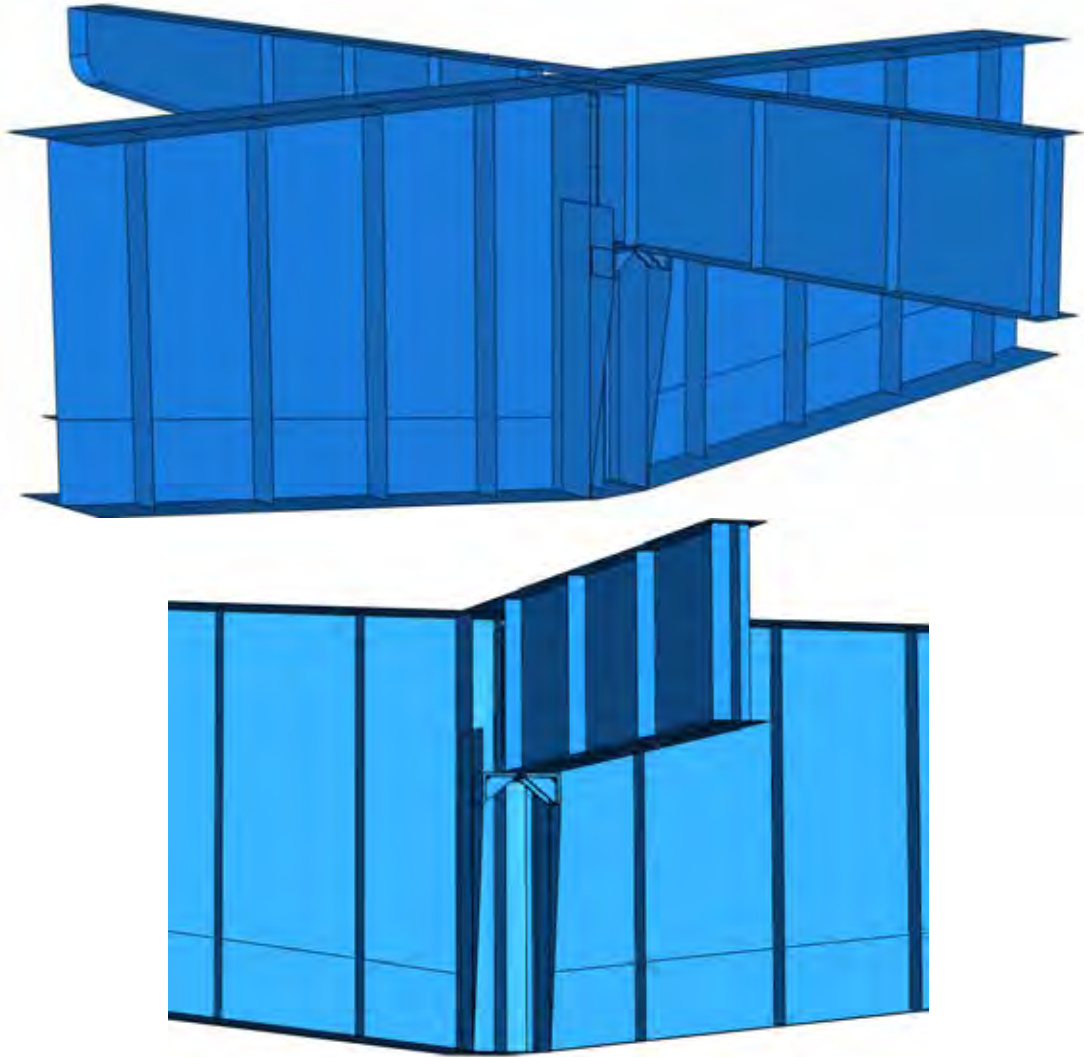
Views from Finite Element Model Showing Retrofit Brace Plates and Brackets
